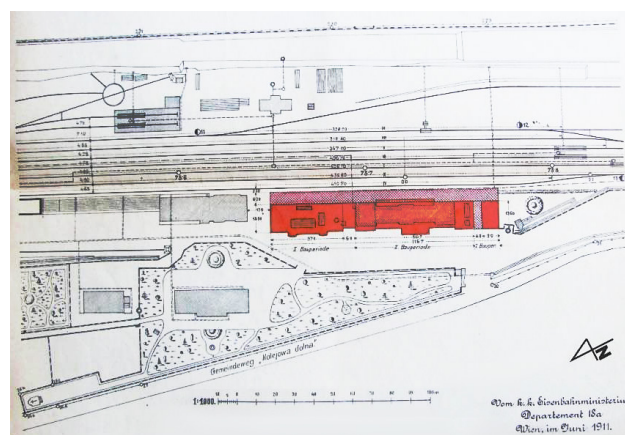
Detail from the drawing “Drohobych station. Station building design. Site plan”
